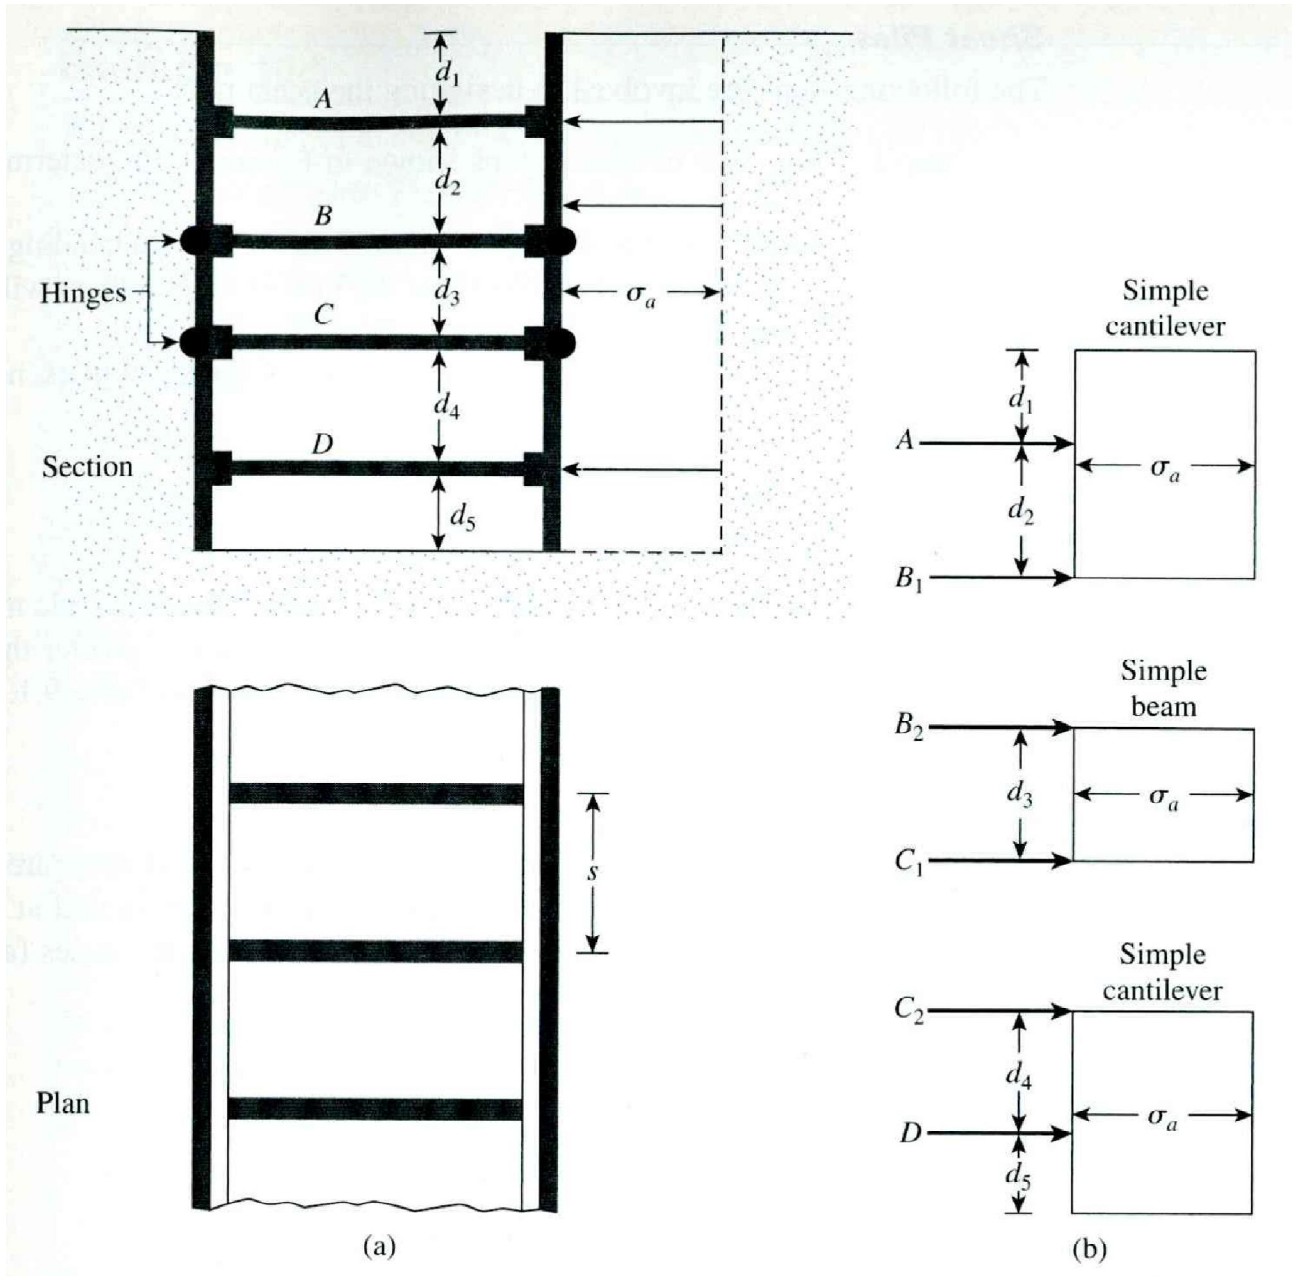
Determination of strut loads: (a) section and plan of the cut; (b) method for determining strut loads
